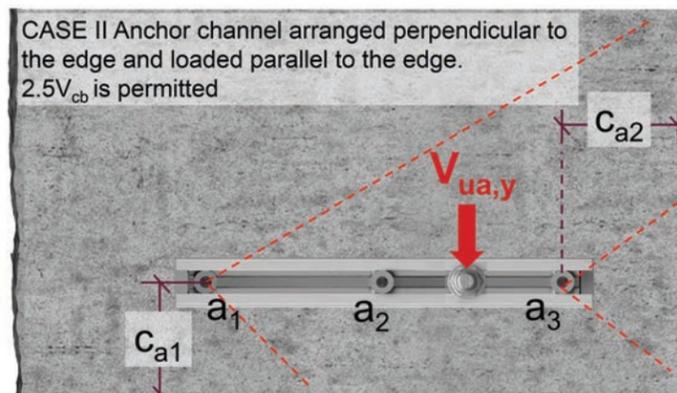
Anchor channel arranged perpendicular to the edge and loaded parallel to the edge.
